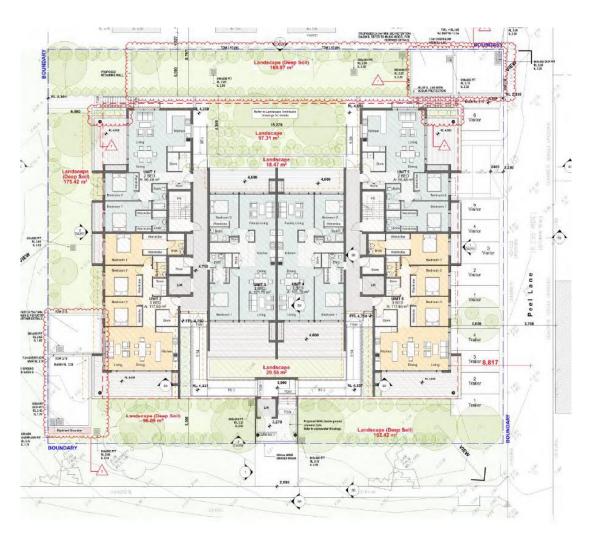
Approved Ground Floor and Site Plan as per DA2021/2458
